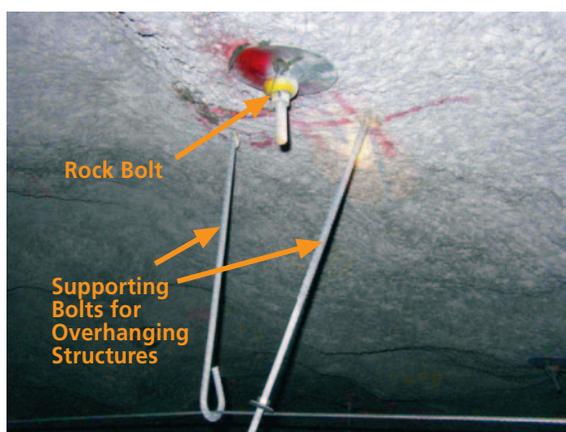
Rock bolts and supporting bolts commonly used in underground space
